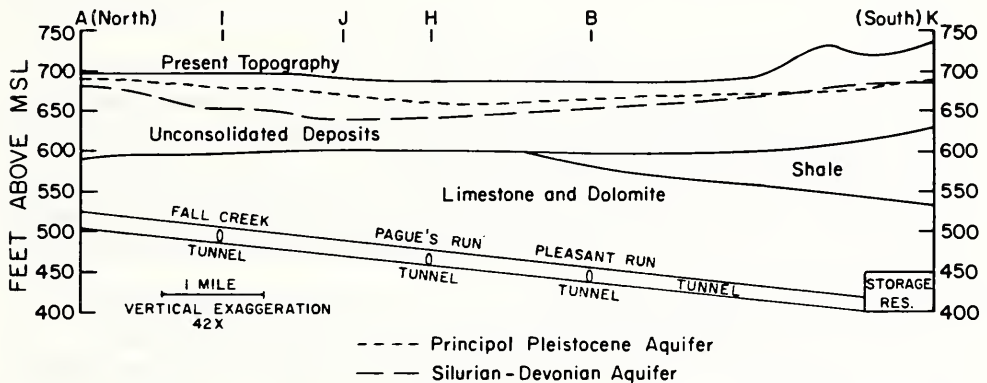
Cross-section of the tunnel and storage reservoir for area beneath White River.
